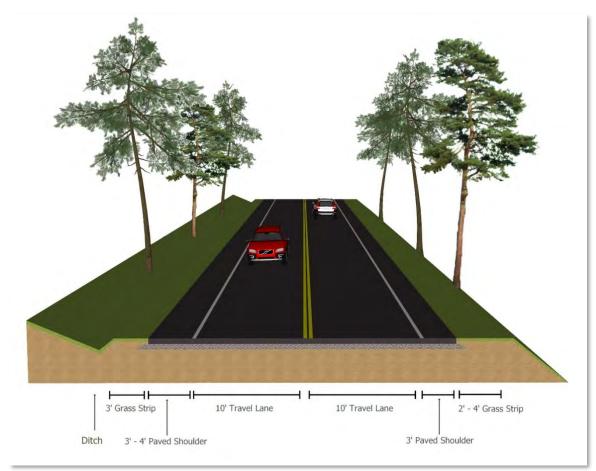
Cross-Section Between Windy Woods Road And Reedy Creek Road
